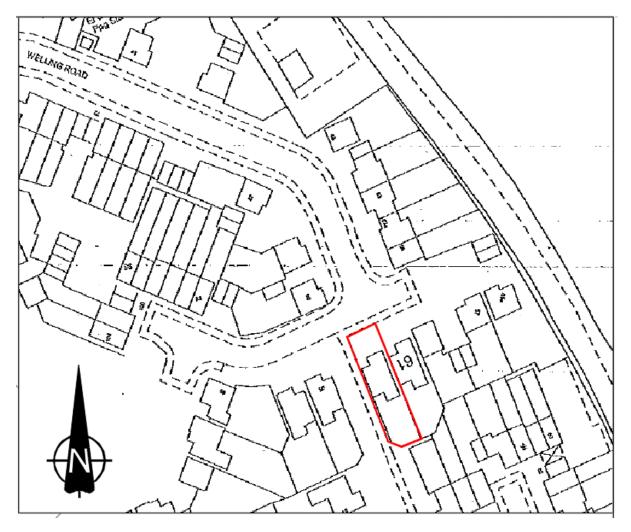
Site Plan of 63 Welling Road, Orsett, RM16 3DW
